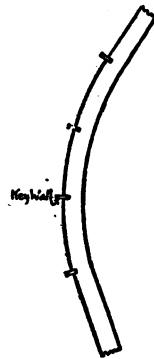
Key walls used at outside edge of sharp curve of concrete-lined ditch. To prevent storm water leaving ditch.
